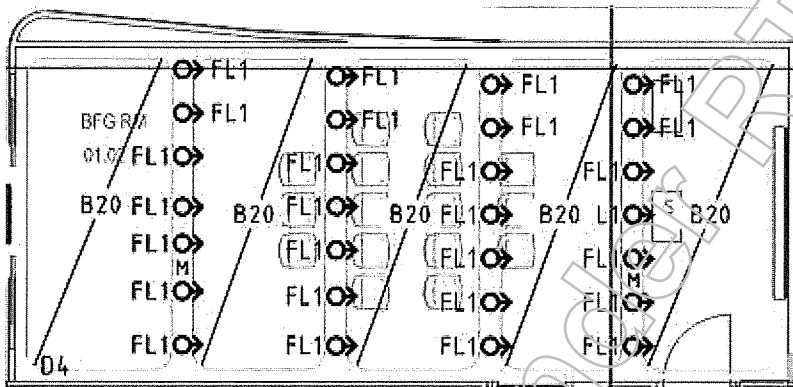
Briefing Room Lighting (1:100) – Part plan EF-72-01[B]
